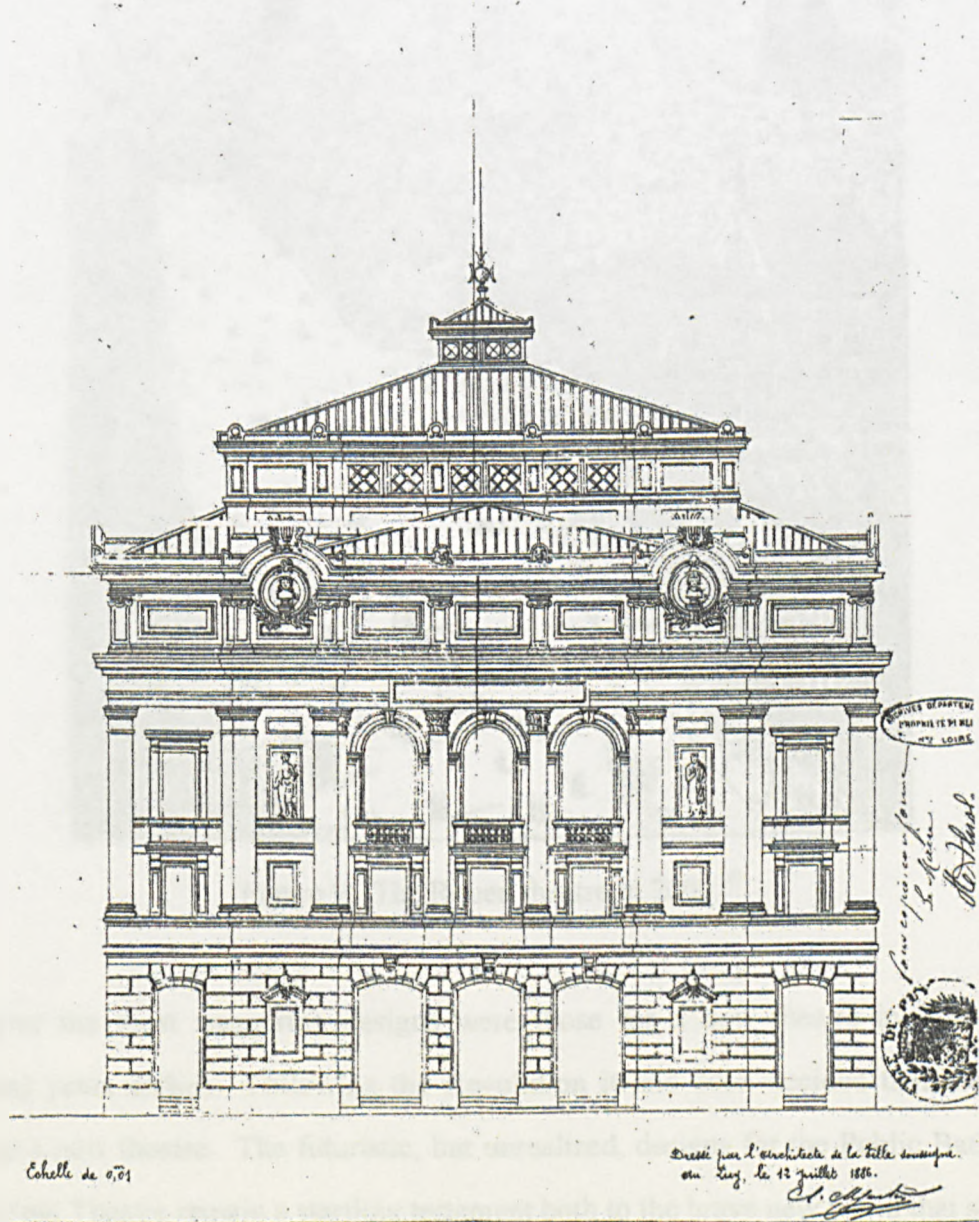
Architect's plan of new theatre for Le Puy, 1886 (ADH-L)
